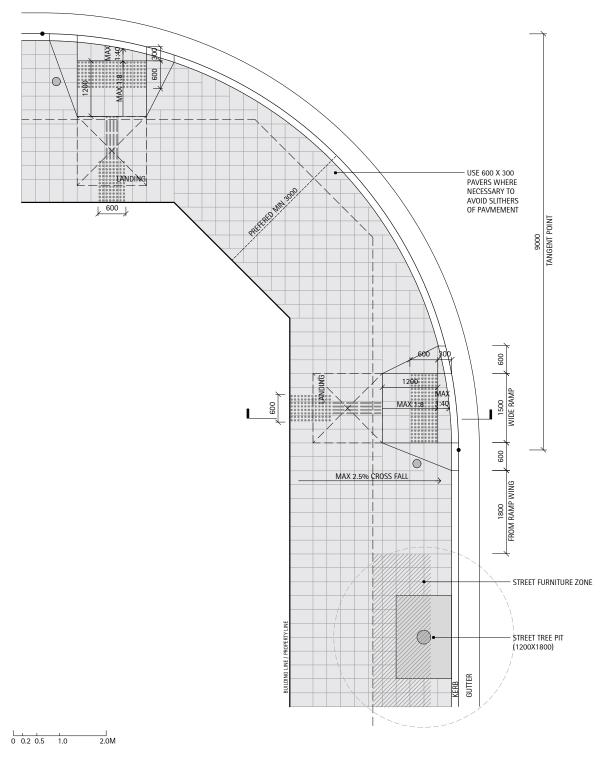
Streets Corner Plan: 9000 Radius 1500 Ramp
